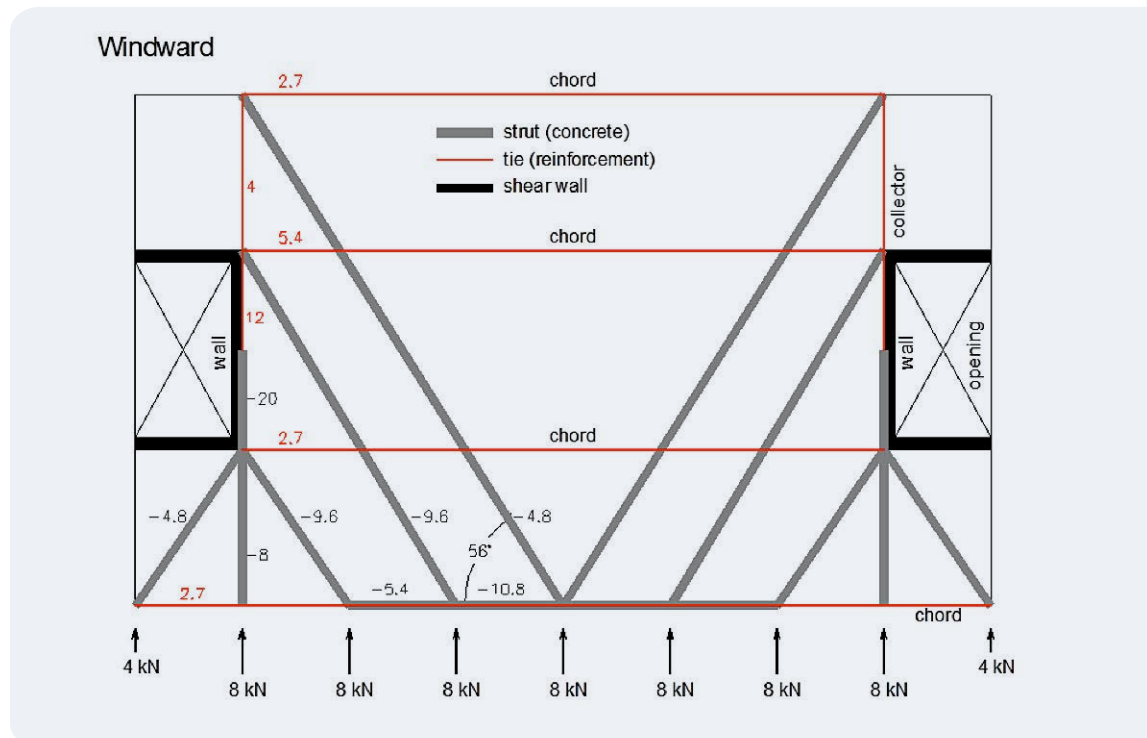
Strut and tie model for wind loads on the windward façade.
